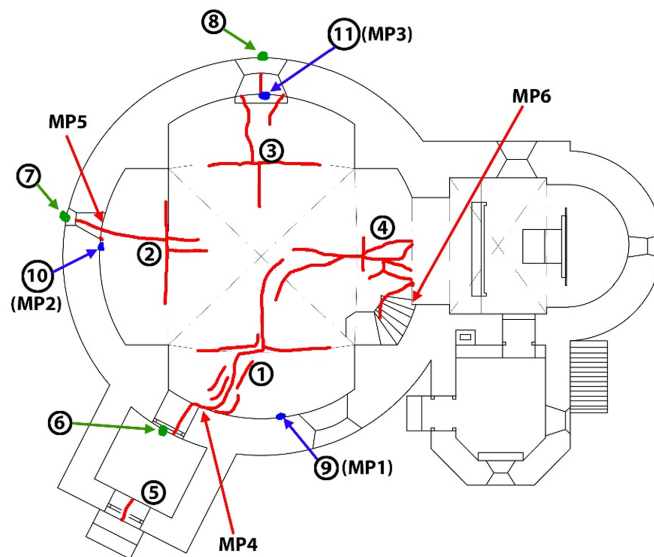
Plan view of Skörstorp's church from crack-investigation carried out by Carl Thelin in 2020 with cracks marked out in red, used with permission.
